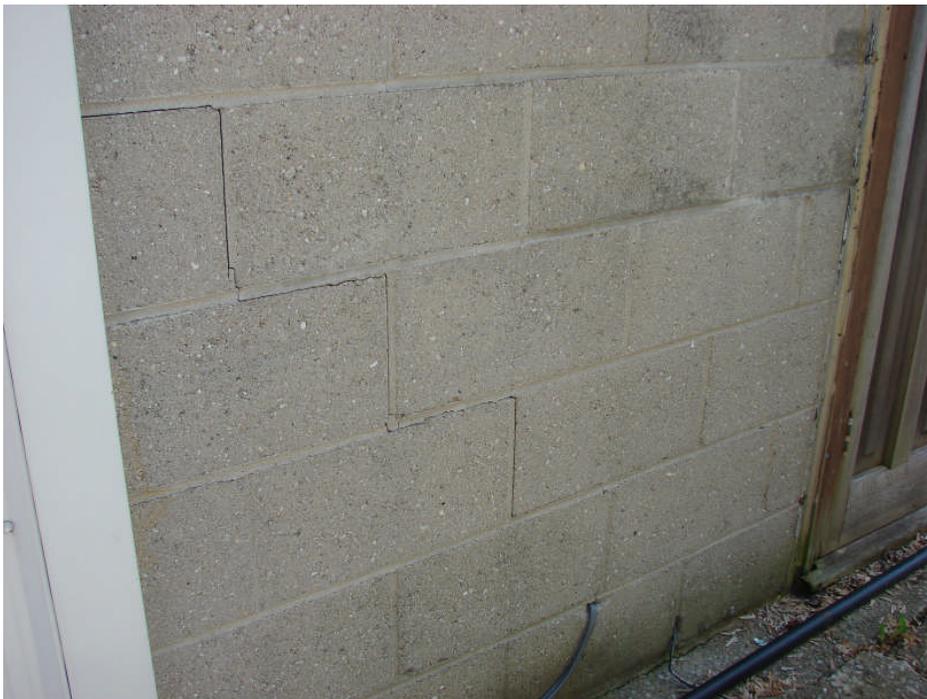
Garage Building west elevation – concrete block wall step cracking below south window, typical.
